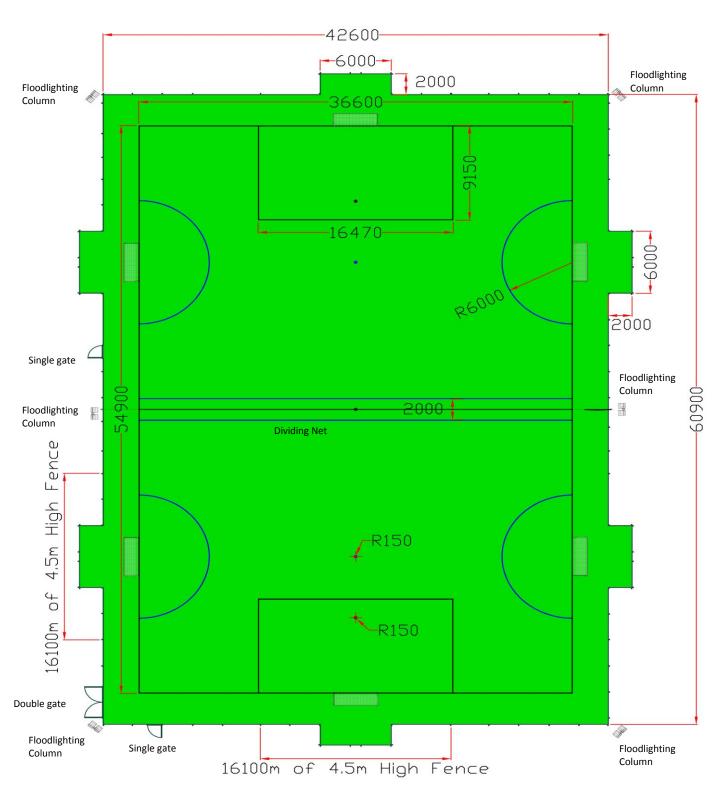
and 4 show the dimensions and typical layouts of a senior 11 a-side pitch and a under 9 /10 mini-soccer pitch.
